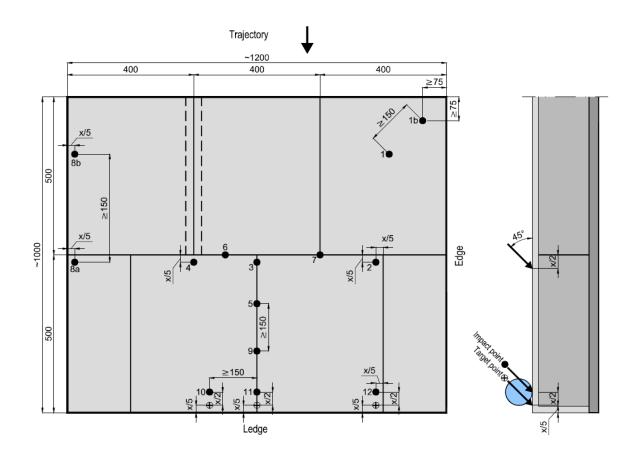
Target areas on floor plan (left figure) and cross-section (right figure)
